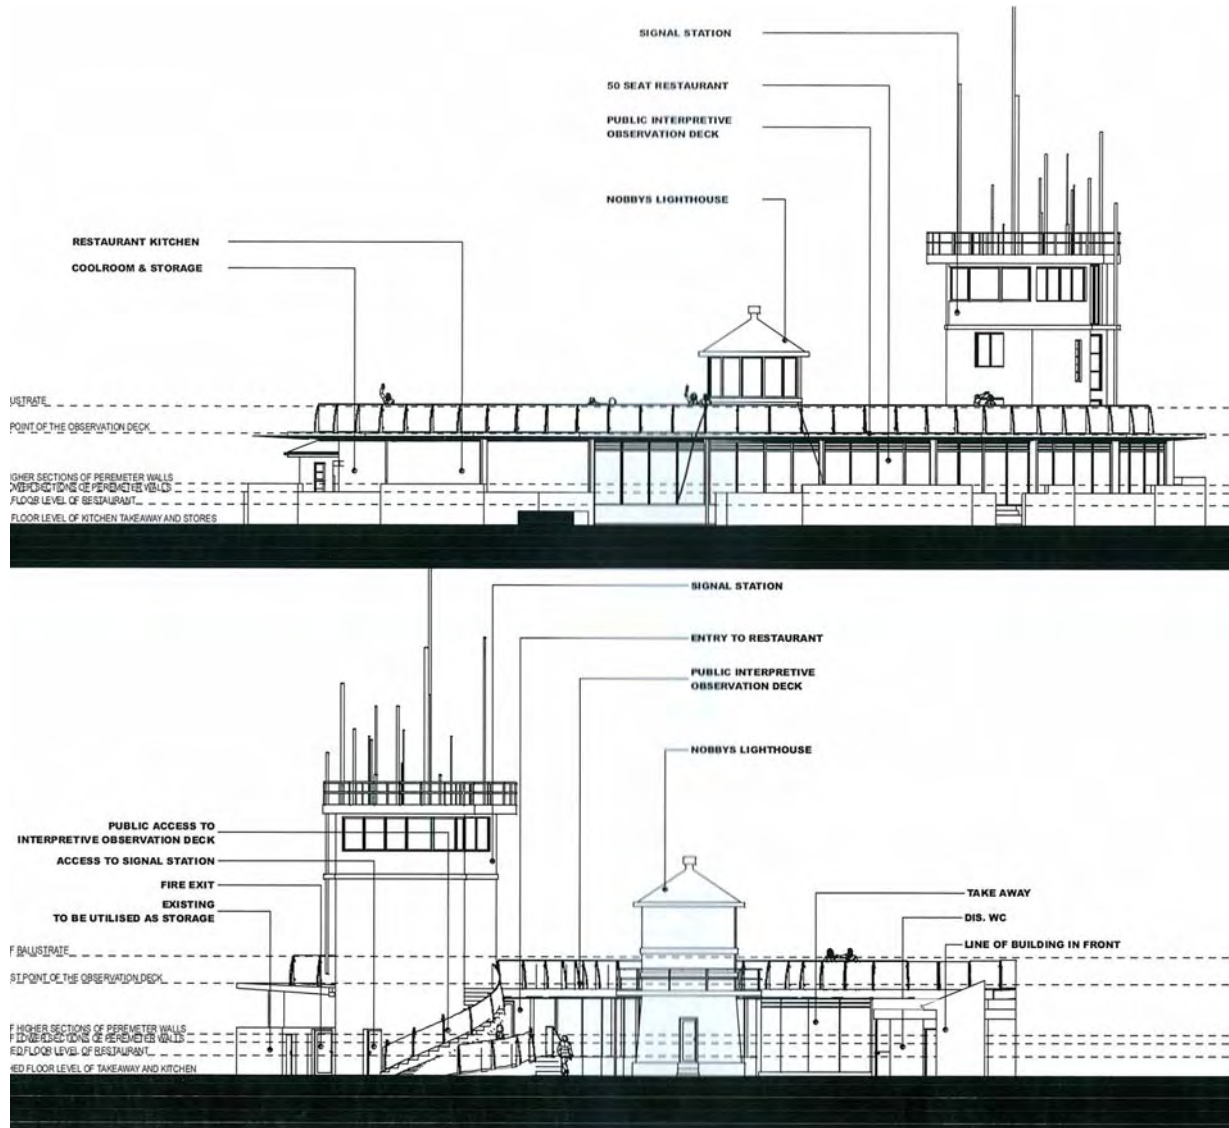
Two elevations showing the relationship of the proposed restaurant building and Nobby's Lighthouse.
